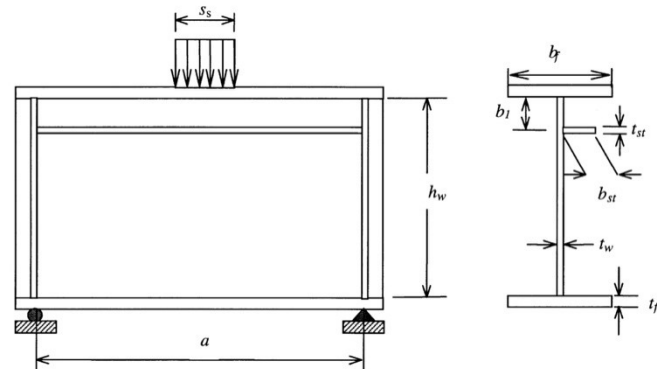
Parameter notation of longitudinally stiffened girders under patch loading [28, p. 1234]
